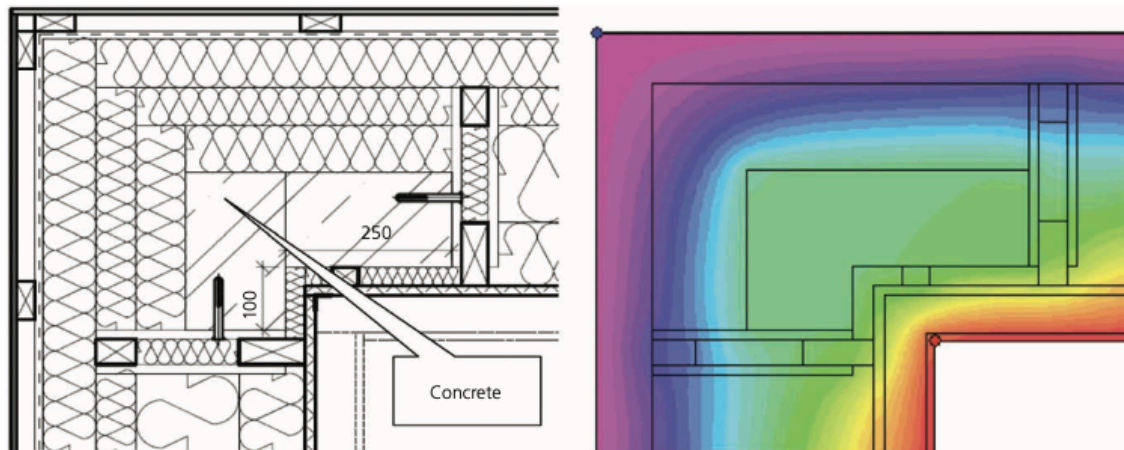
Minimised concrete columns are hidden in the building envelope (CS3). Left: detailed horizontal cross-section of the building's ground floor corner. Right: simulation of temperature
